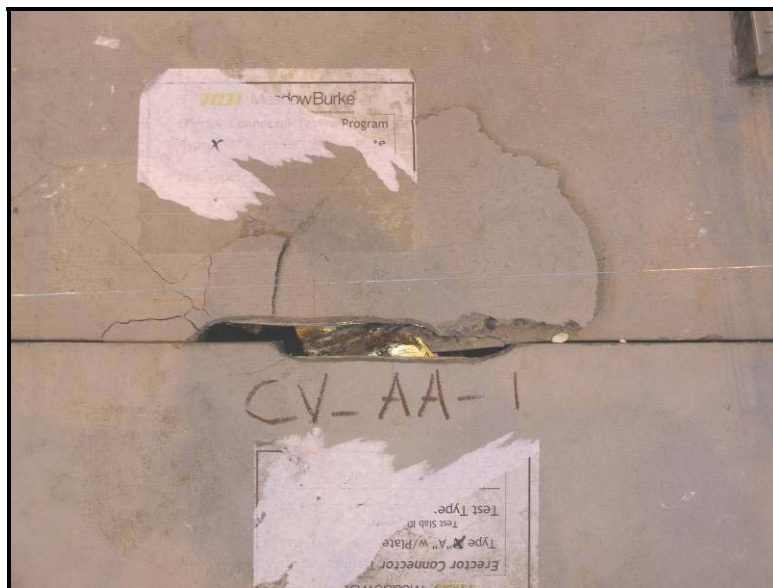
Specimen CV\_AA-1 - spalling of top surface of panel at a load of 9.2 kip
